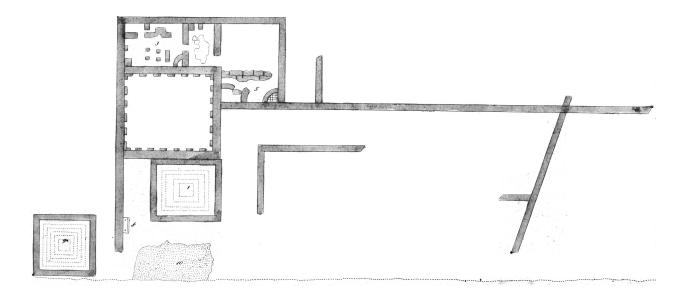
Plan from Ecroyd Smith 1952 Pl. XV showing the buildings revealed in the excavations of 1832 and 1848
